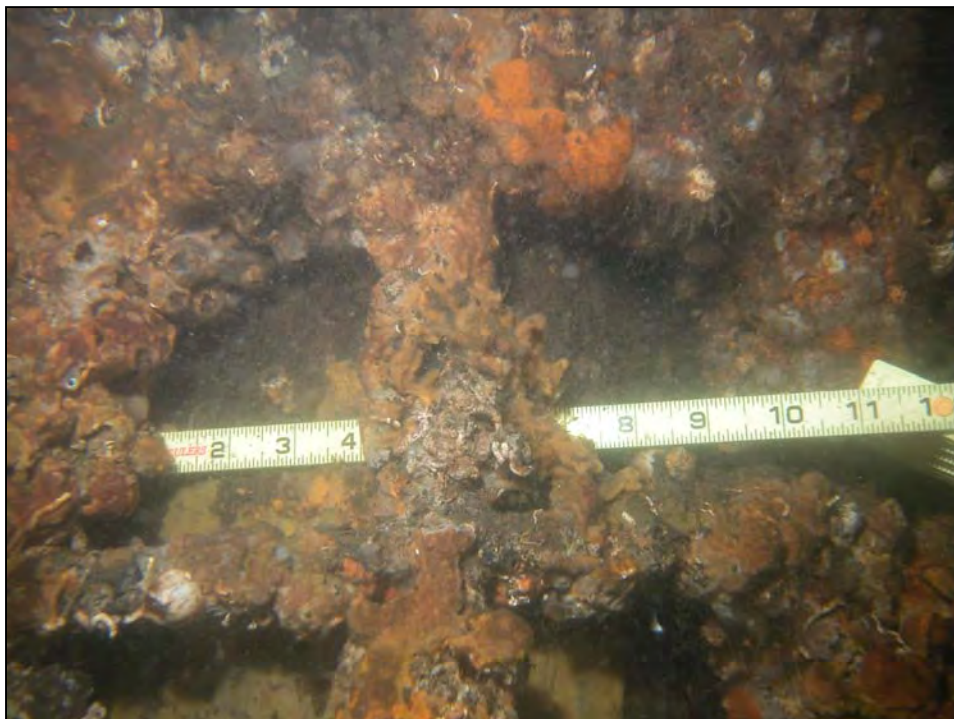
Underwater photo of exposed reinforcement. (Photo by Childs Engineering Corp.)
